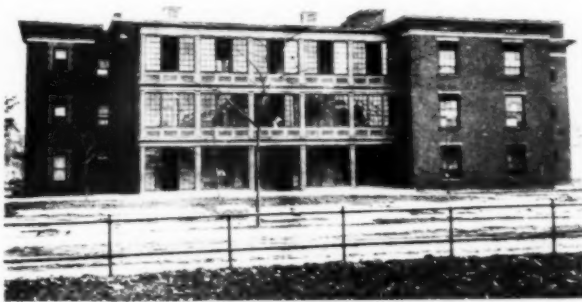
Hospital for Feeble-Minded Children, Randall's Island, in which existing walls have been utilized as fire walls.
